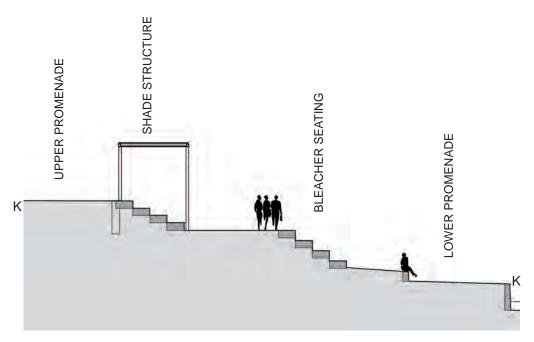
SECTION THROUGH PROPOSED BATHS SHADE STRUCTURE SCALE 1:200 $\,$
